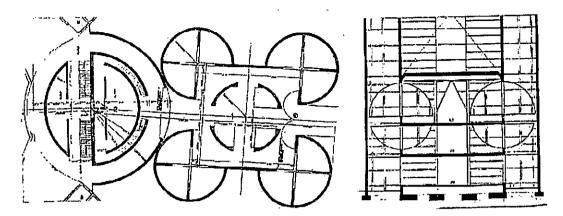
Plan at 68 feet level, showing stairwell as connection between the assembly hall and the prayer hall.
